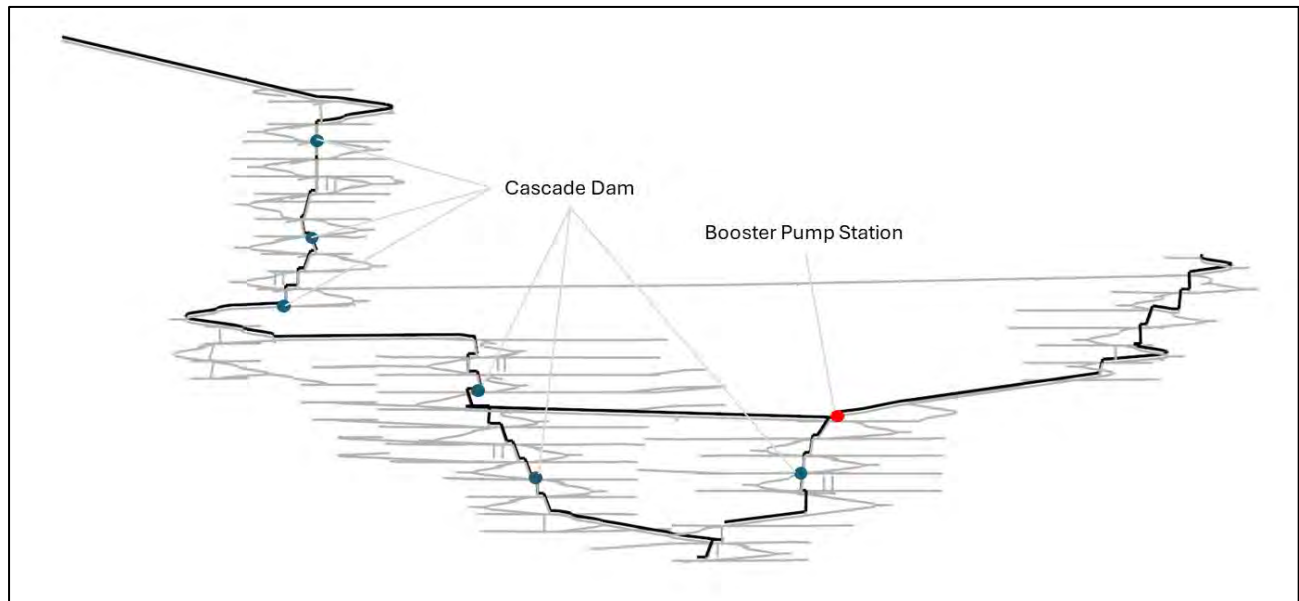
Service Water Pipe Routing, Booster Pump Station, and Cascade Dam Location.
